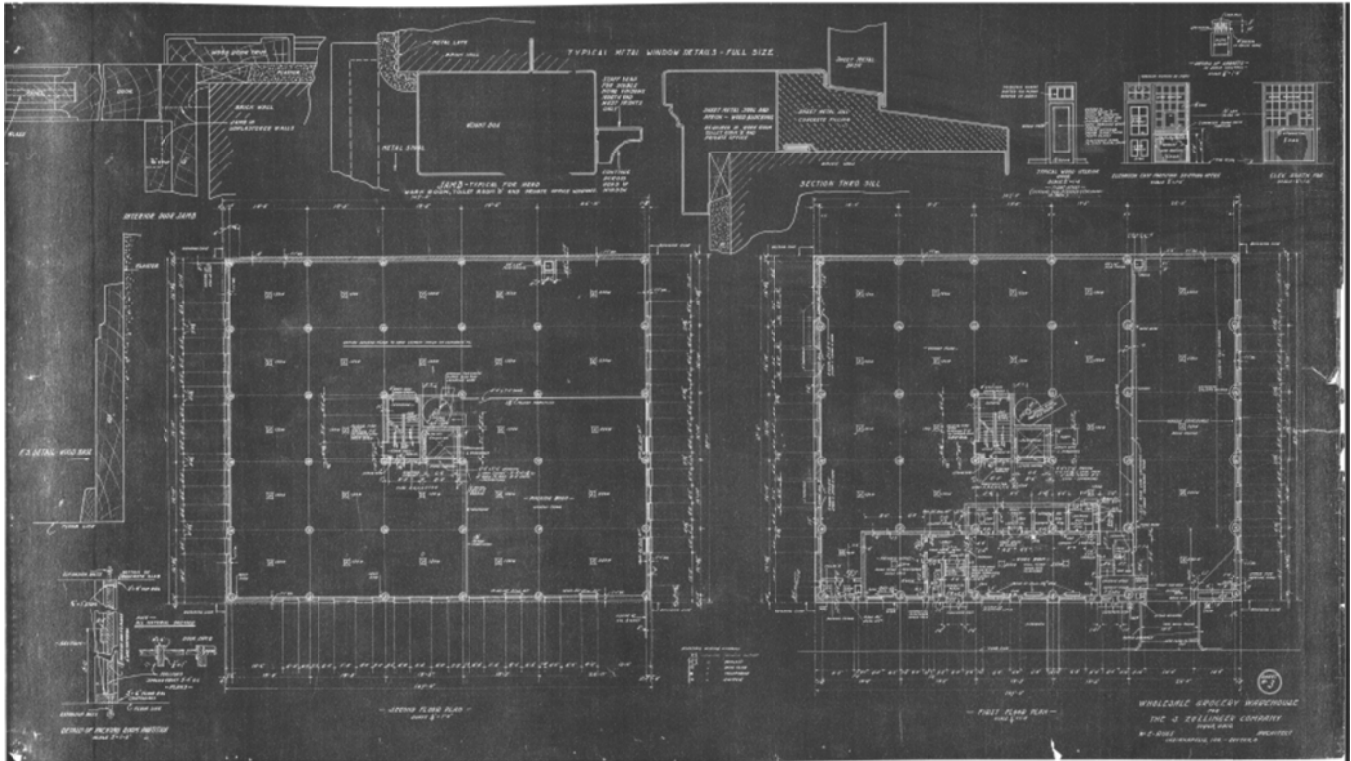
First and Second Floor Plans and other details of the Zollinger Building, prepared by William Earl Russ, Architect, in 1914.
